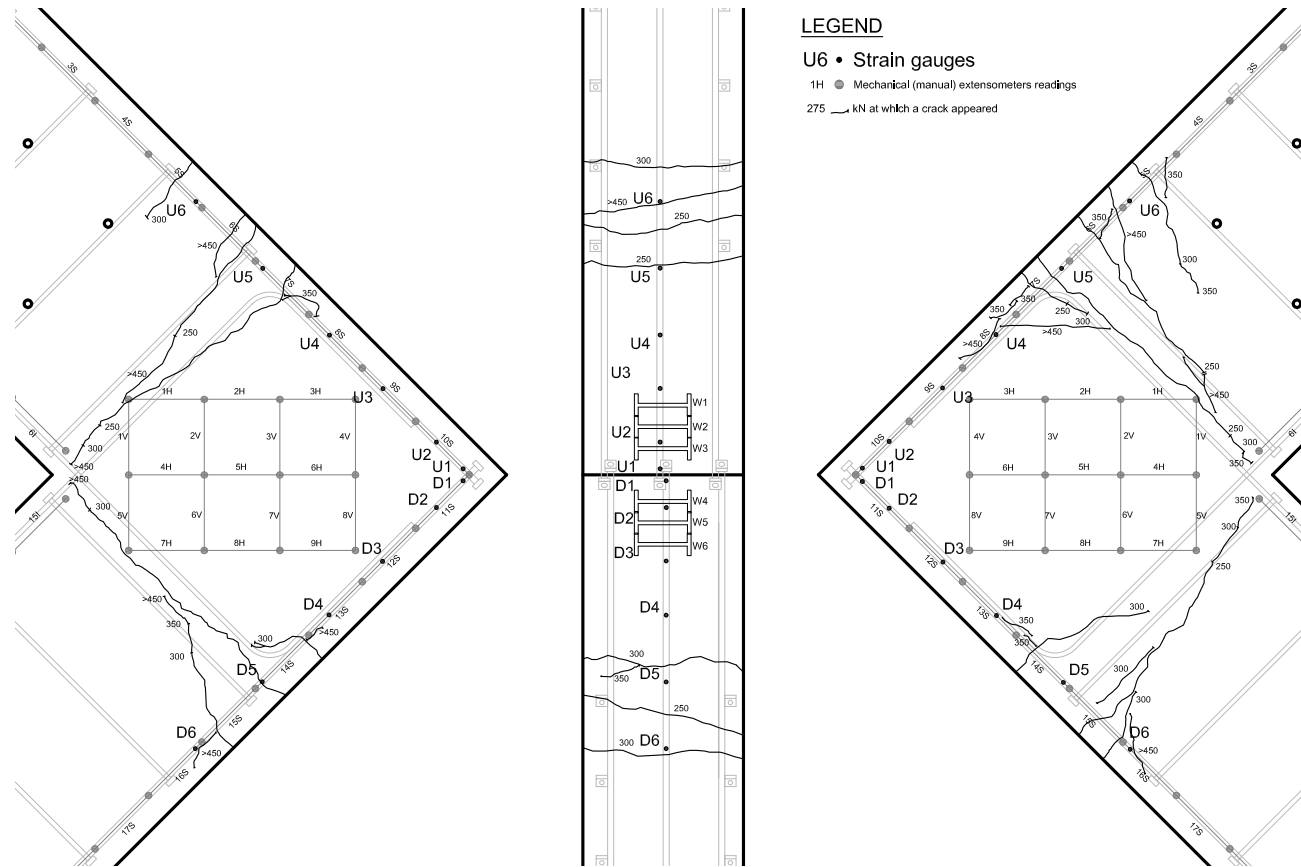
45-TH-16. Crack pattern before failure. From left to right: front view (A), side view, front view (B)
